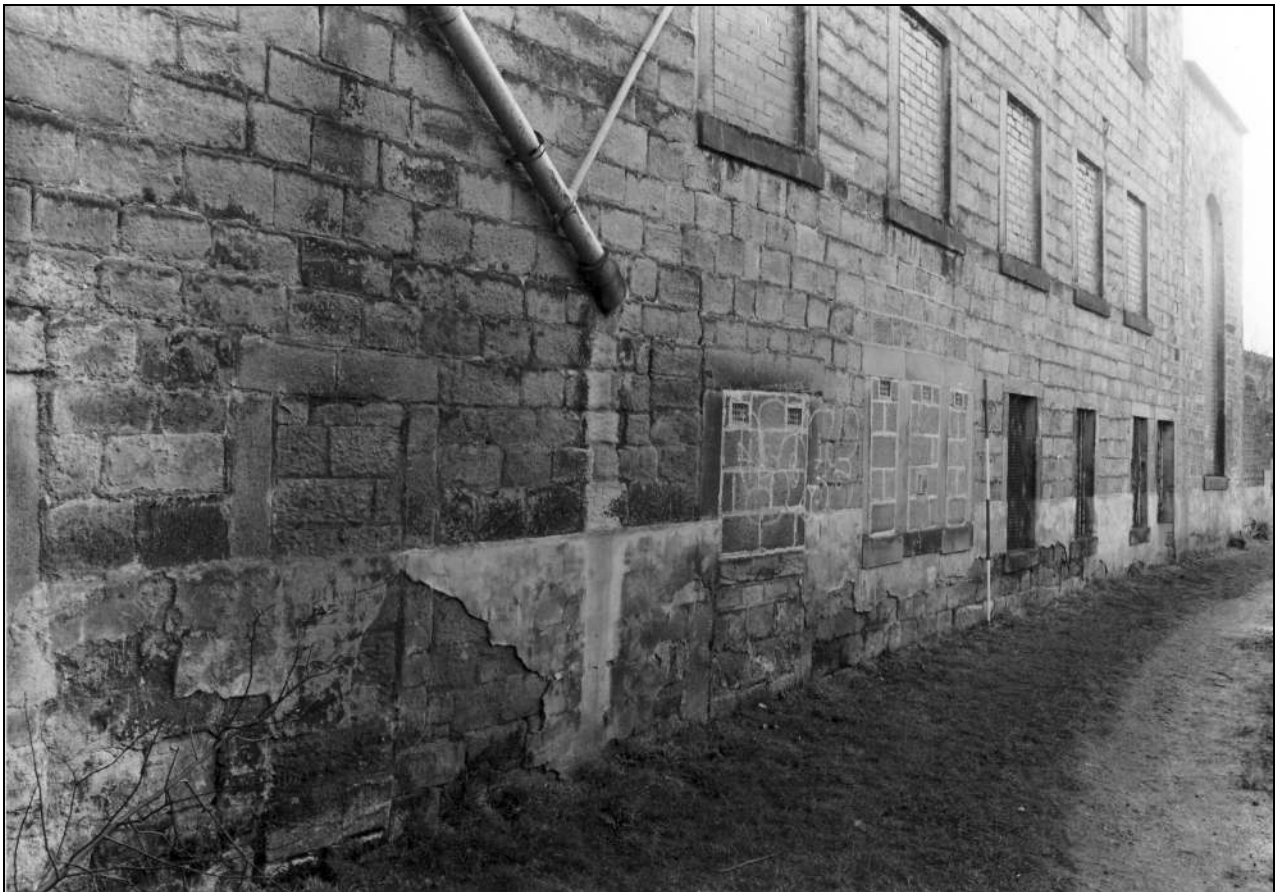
Ground floor of spinning mill, north elevation (film 5, frame 7)
